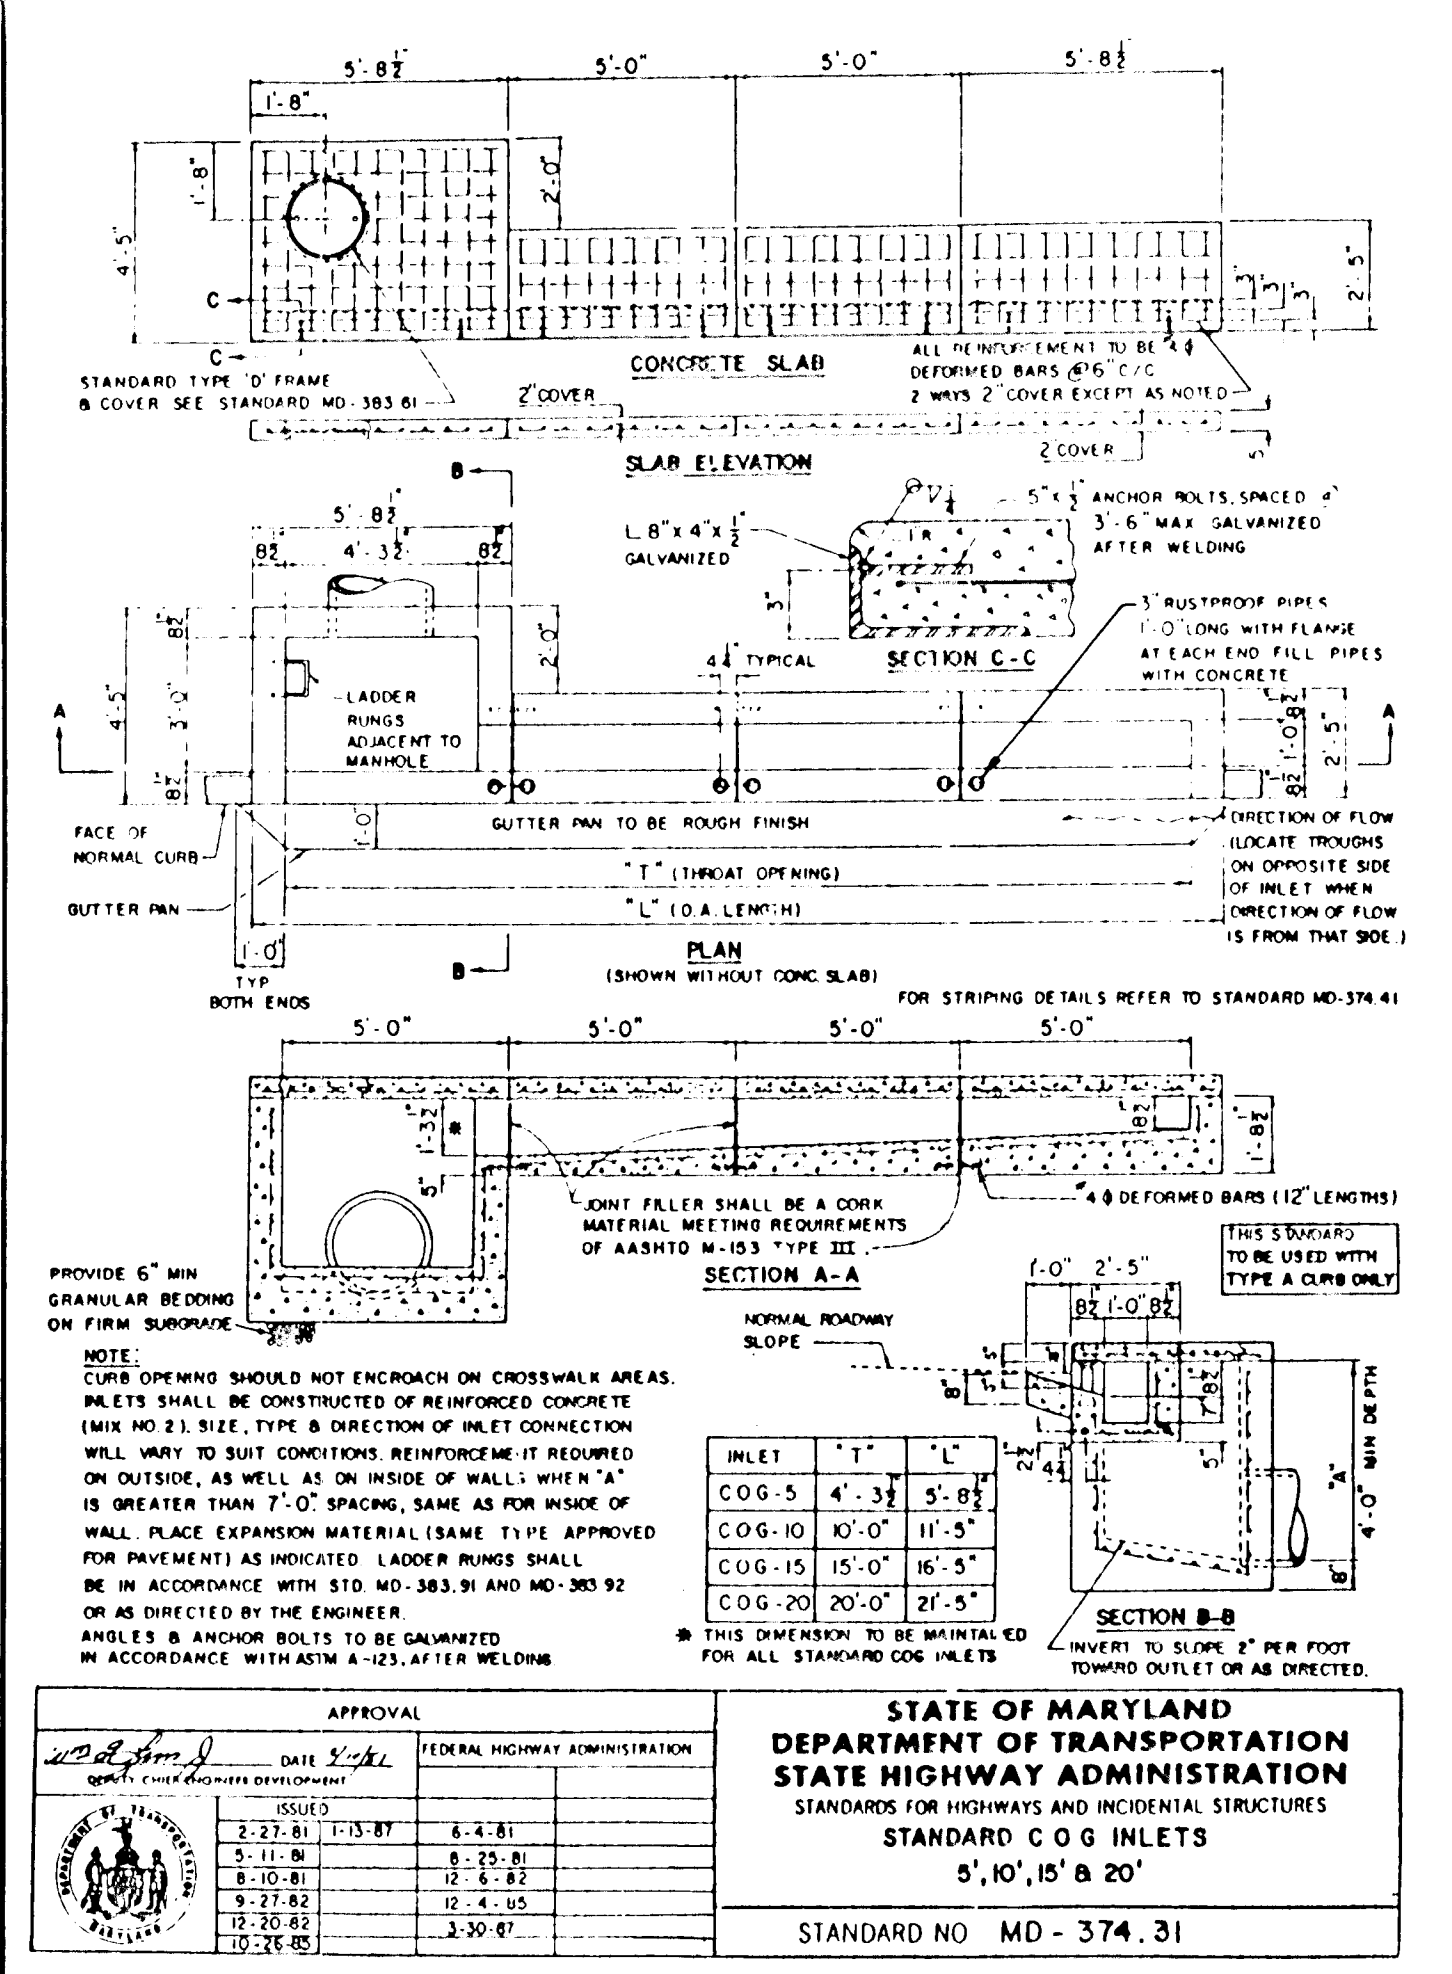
DETAIL B MODIFIED INLET - 374.31 & 374.41
